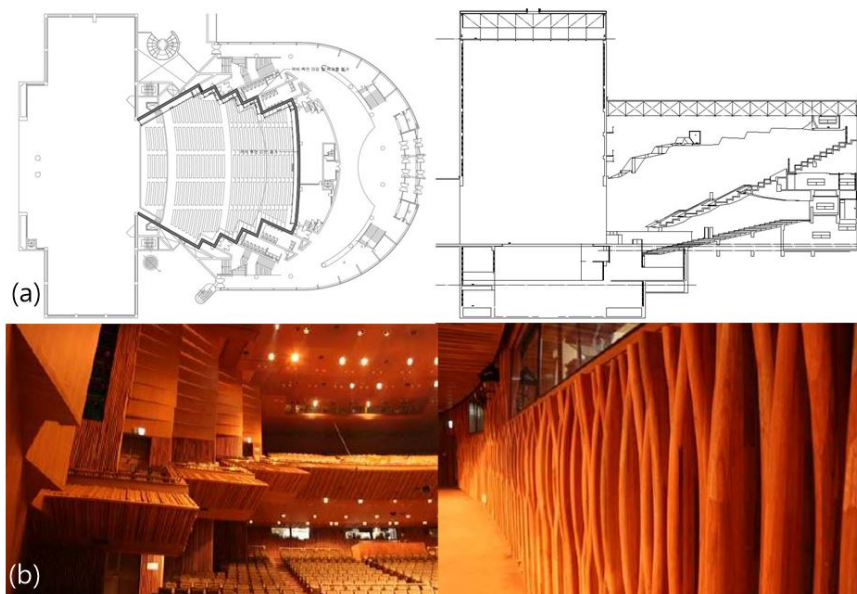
The feature of the hall: (a) Plan and sectional view and (b) Balcony front and rear wall.
